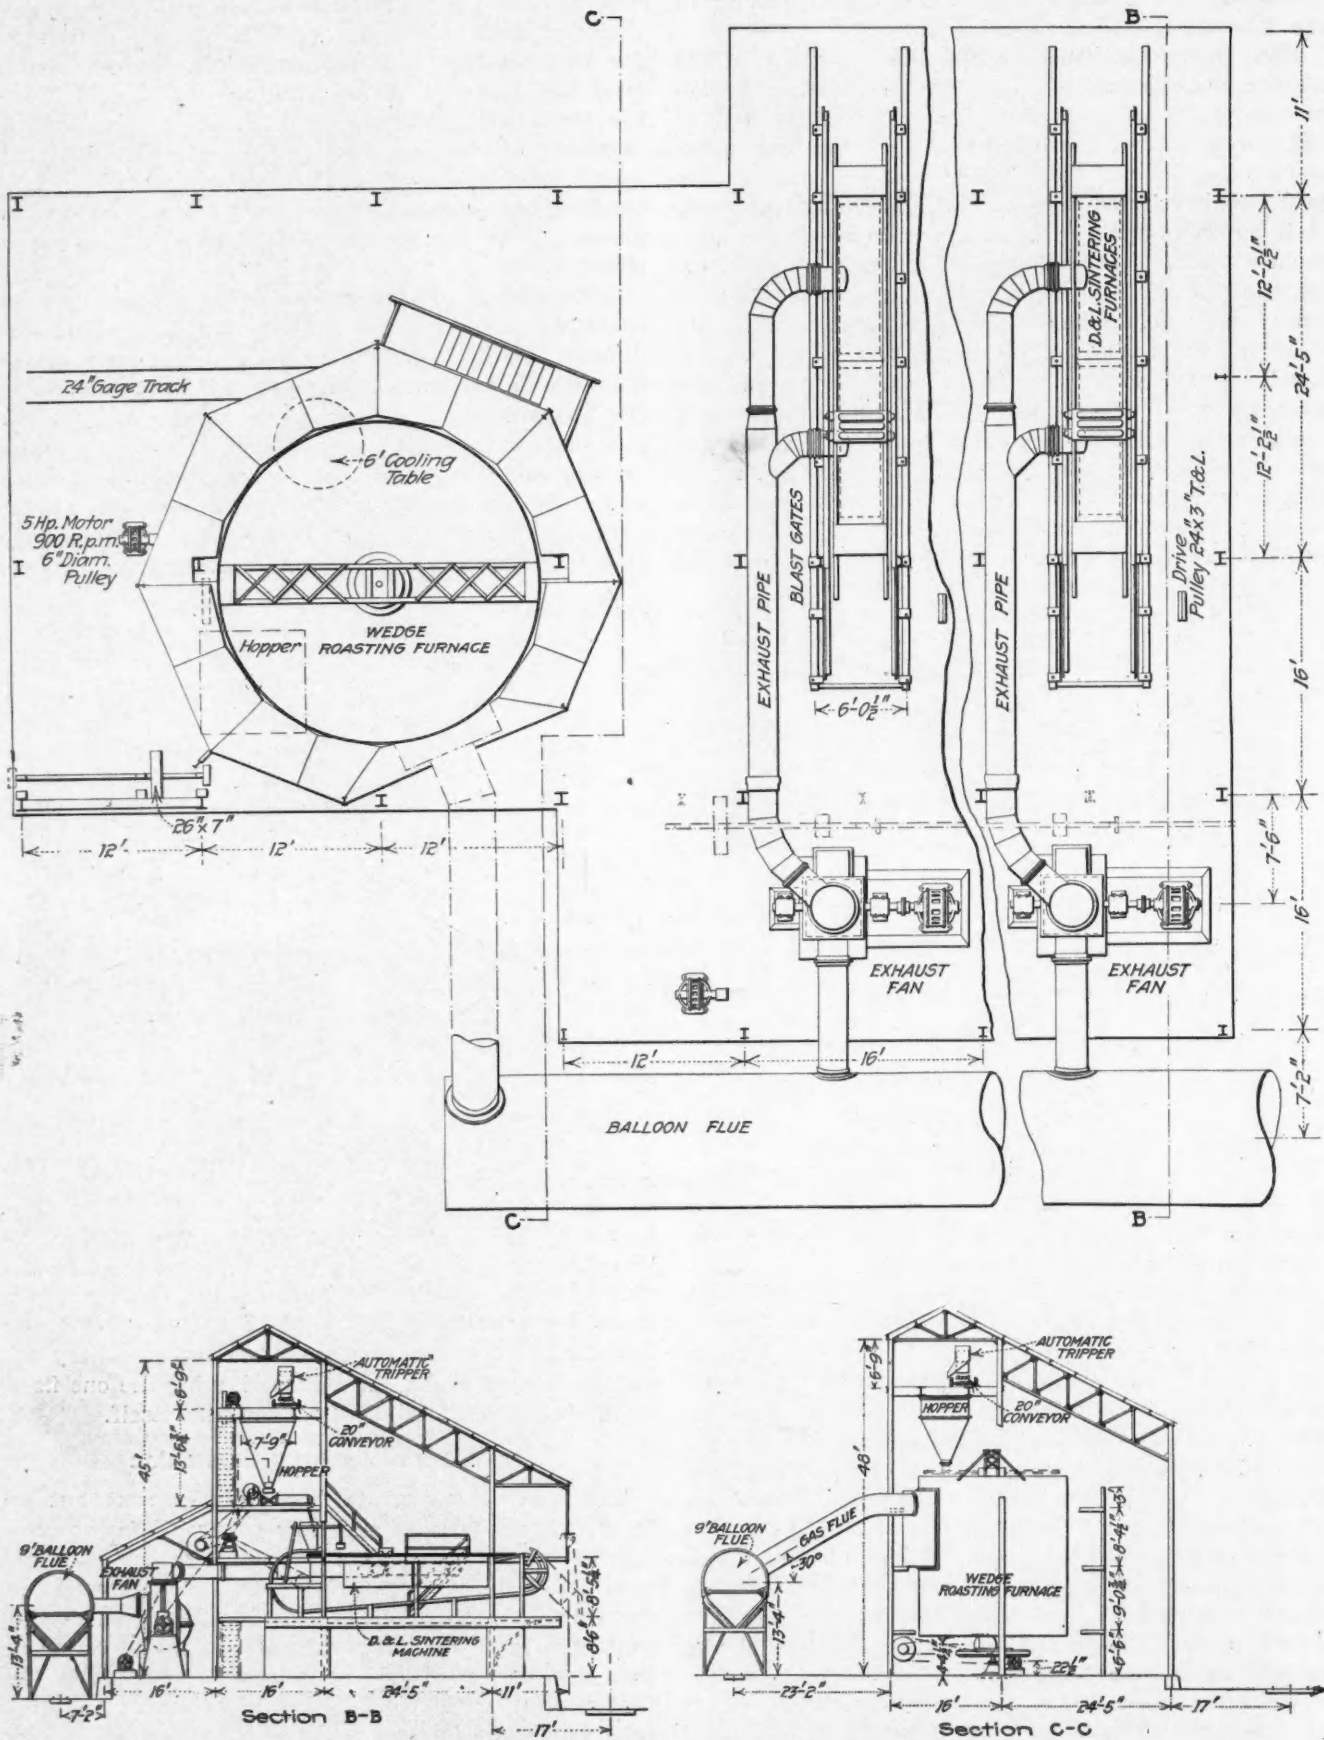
PLAN AND CROSS SECTION OF ROASTER PLANT
